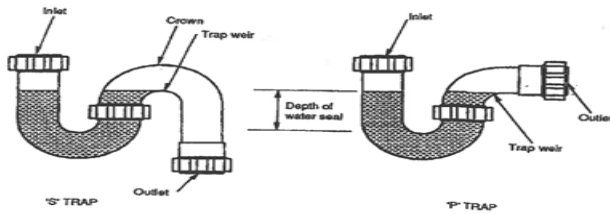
EXAMPLES OF FIXTURE TRAPS
